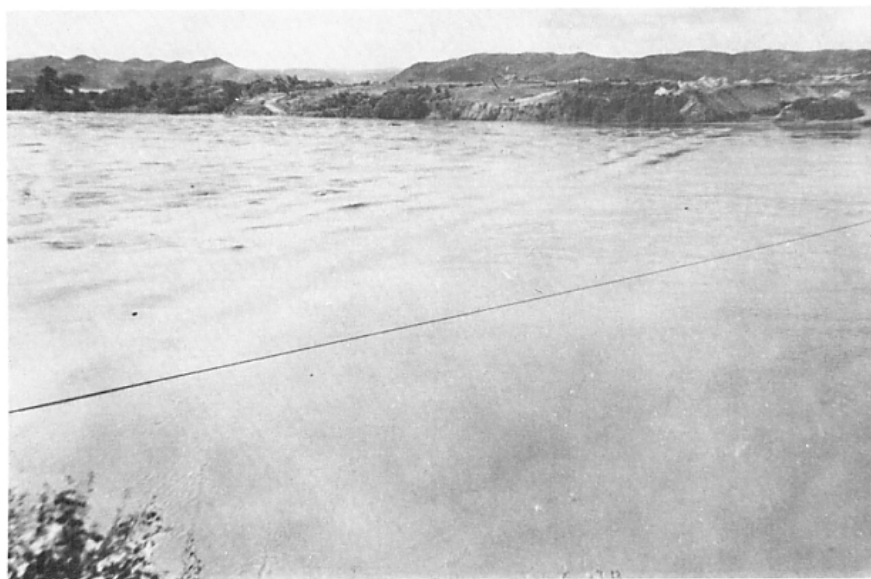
Teal bridge underwater on 15 July 1953, viewed from the south approach road.
